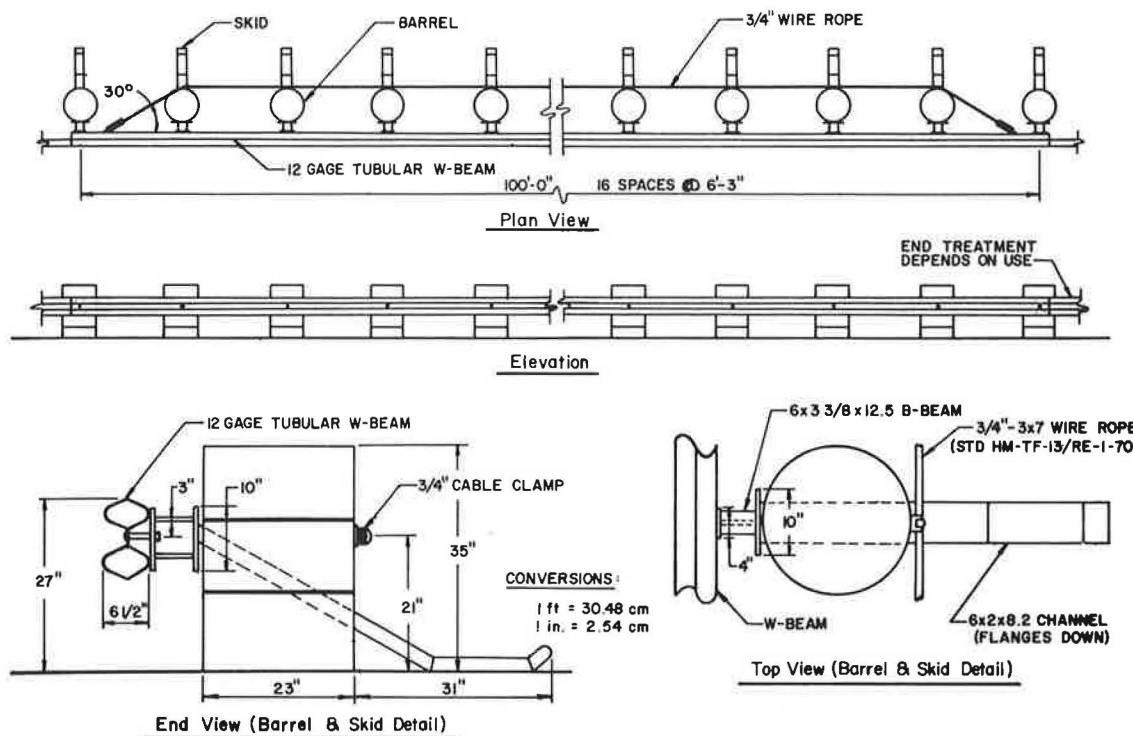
Stabilized barrel/W-section 1 (SBW1).
